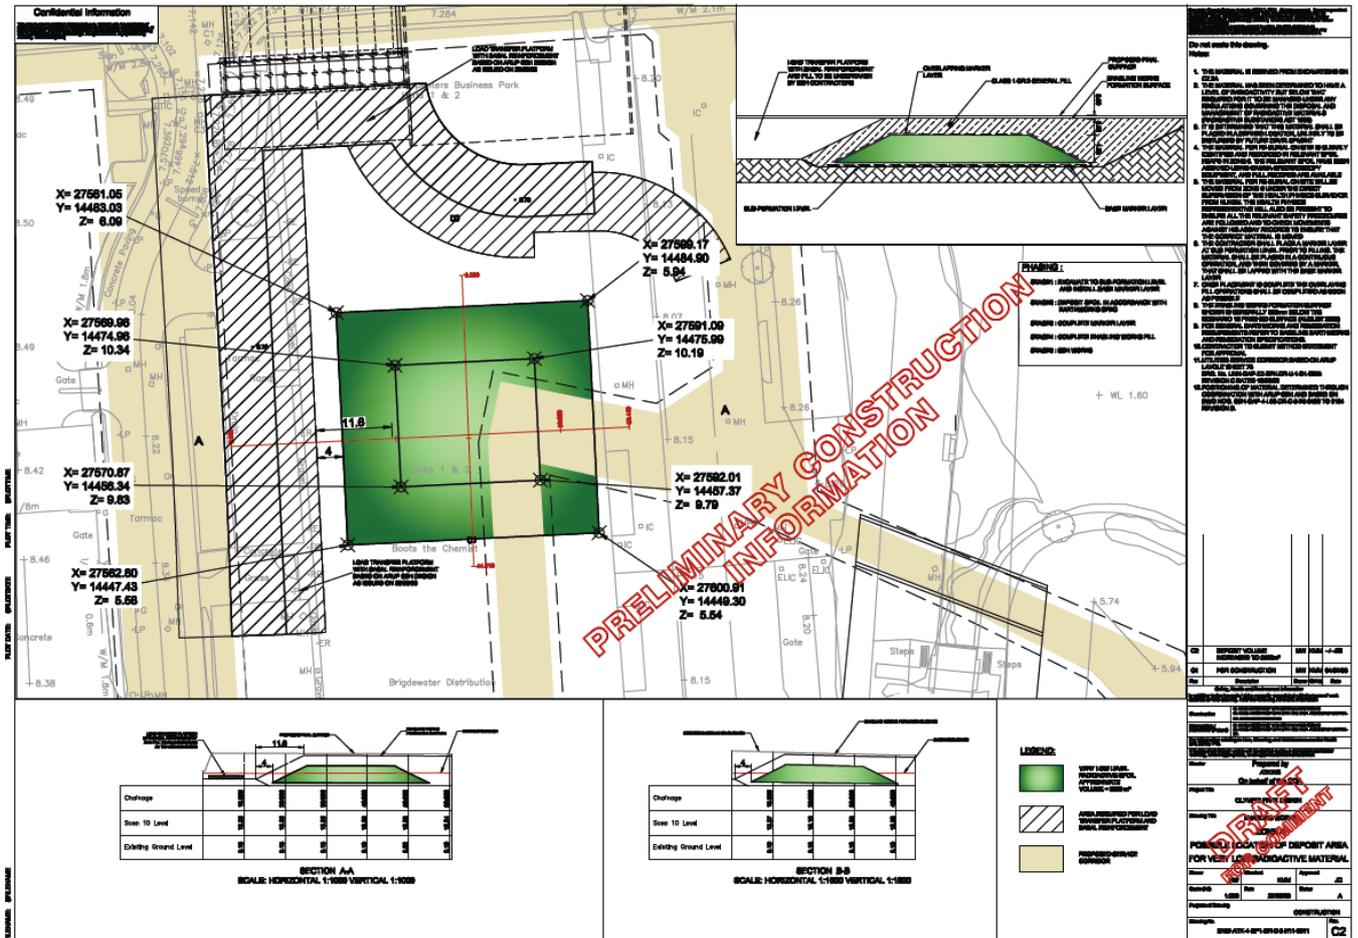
A dimensioned Plan View of the proposed Waste Disposal Cell
